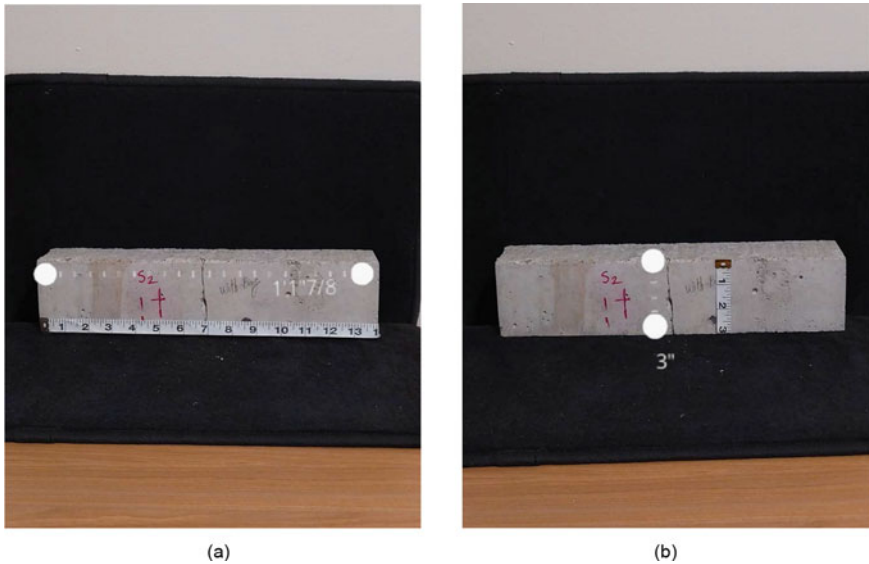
Measurements of a concrete beam; a beam length, and b crack depth
